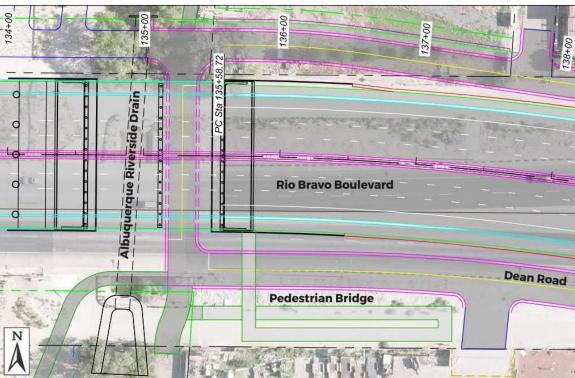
, Pedestrian Bridge Option shown in Build Alternative A
